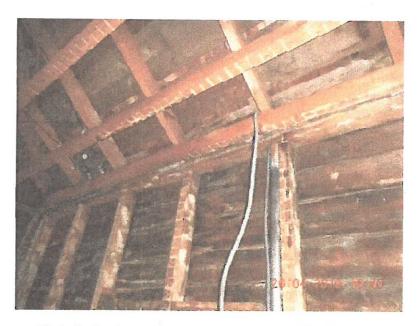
Inadequate load path, rafters bearing on ceiling joist
